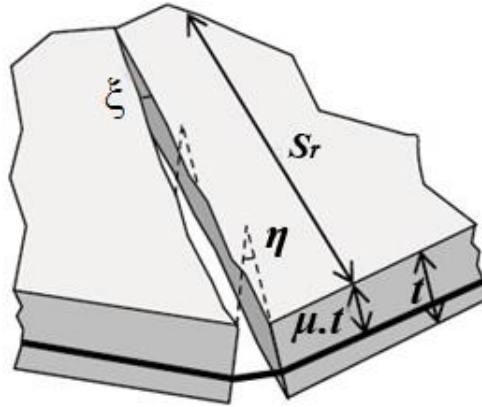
Reinforcement extension due to crack opening and slab facets rotation (Burgess et al. 2013)
